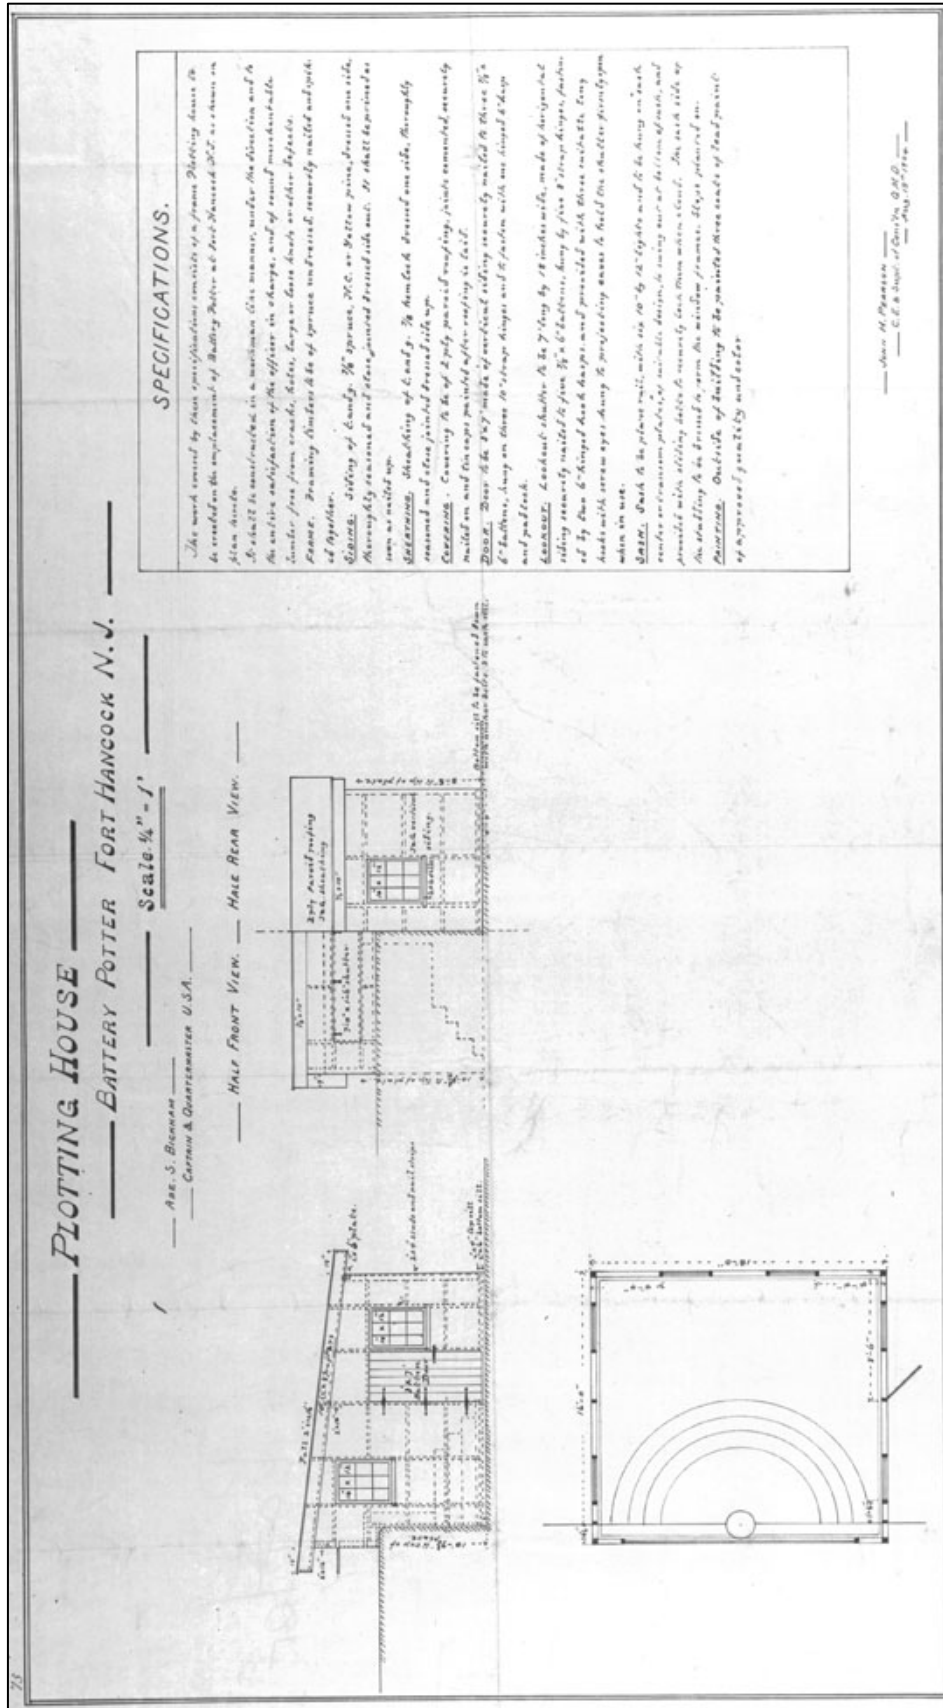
"Plotting House, Battery Potter, Fort Hancock, N.J." Note the plotting house structure to be situated along the parapet wall between the north and south emplacements was apparently not built.
